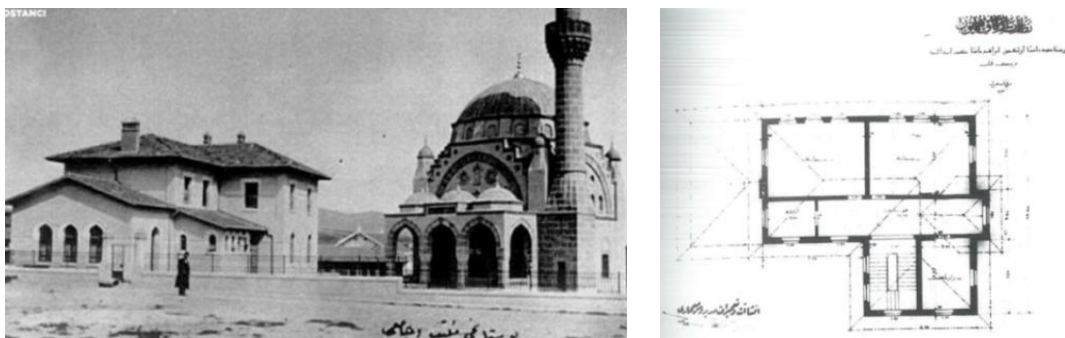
a) İbrahim Paşa Primary school [57], b) İbrahim Paşa Primary school First Floor Plan [42]
